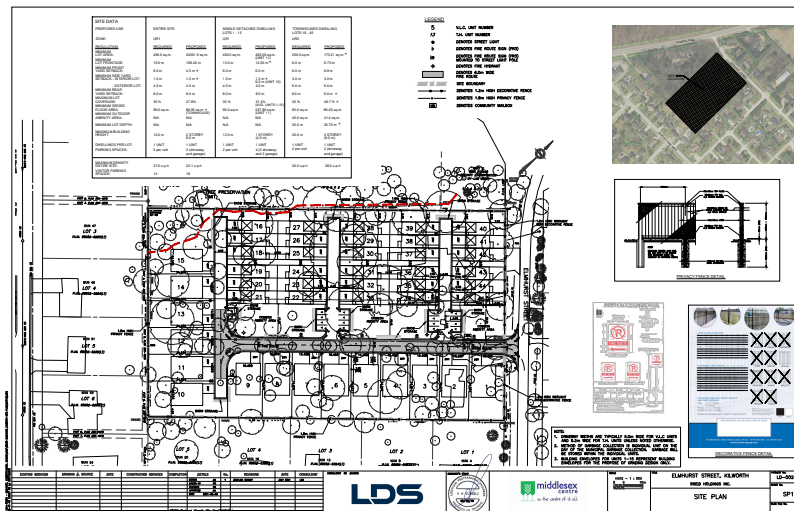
presents a revised proposed site plan that depicts the development of a 15-unit single detached dwelling and 30-unit townhouse dwelling development on the subject property. Access to the property is proposed to be from Elmhurst Street. It is proposed to pursue the approval of the development through the Plan of Condominium process for vacant land condominiums and standard condominiums.
